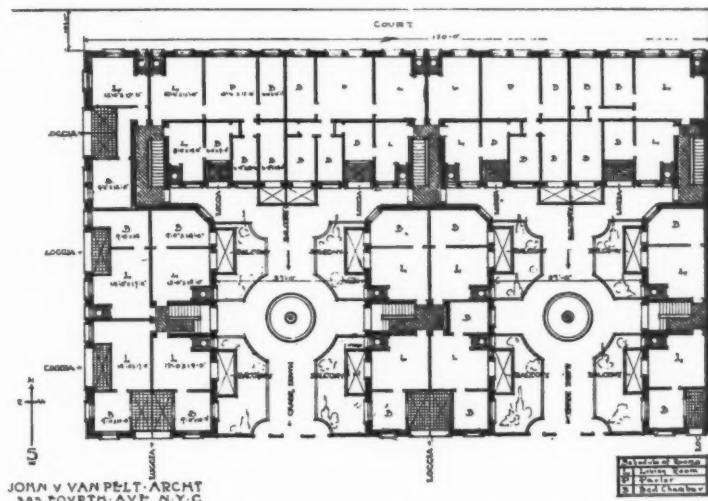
PLAN FOR OPEN-AIR TENEMENT HOUSE.
